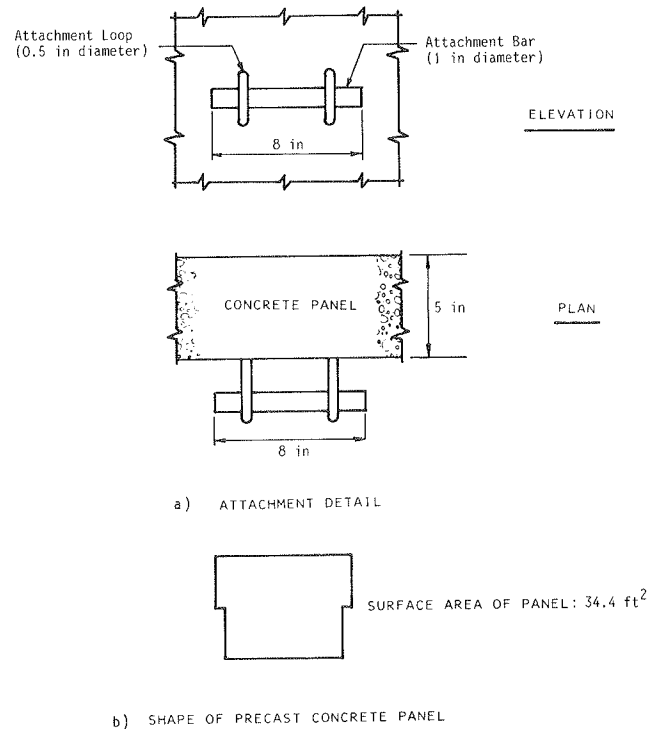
Wall face precast concrete panel (Websol Frictional Anchor System).
